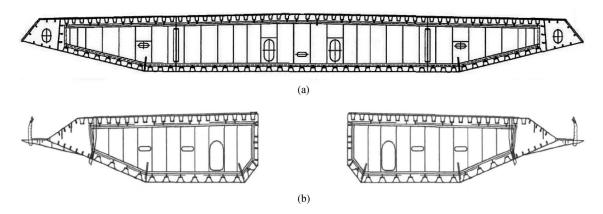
Design of the steel box girder cross-section: (a) single-box girder and (b) double-box girder.
